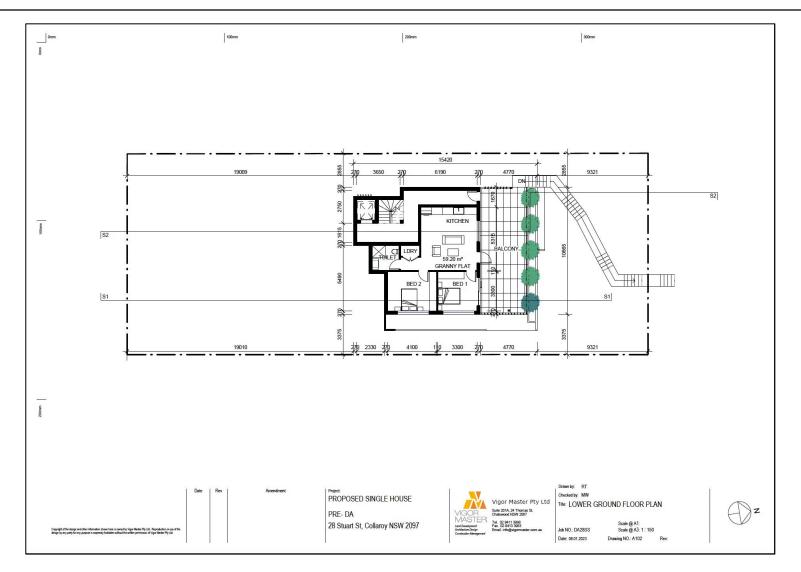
ILLUSTRATES PROPOSED LOWER GROUD FLOOR PLAN
